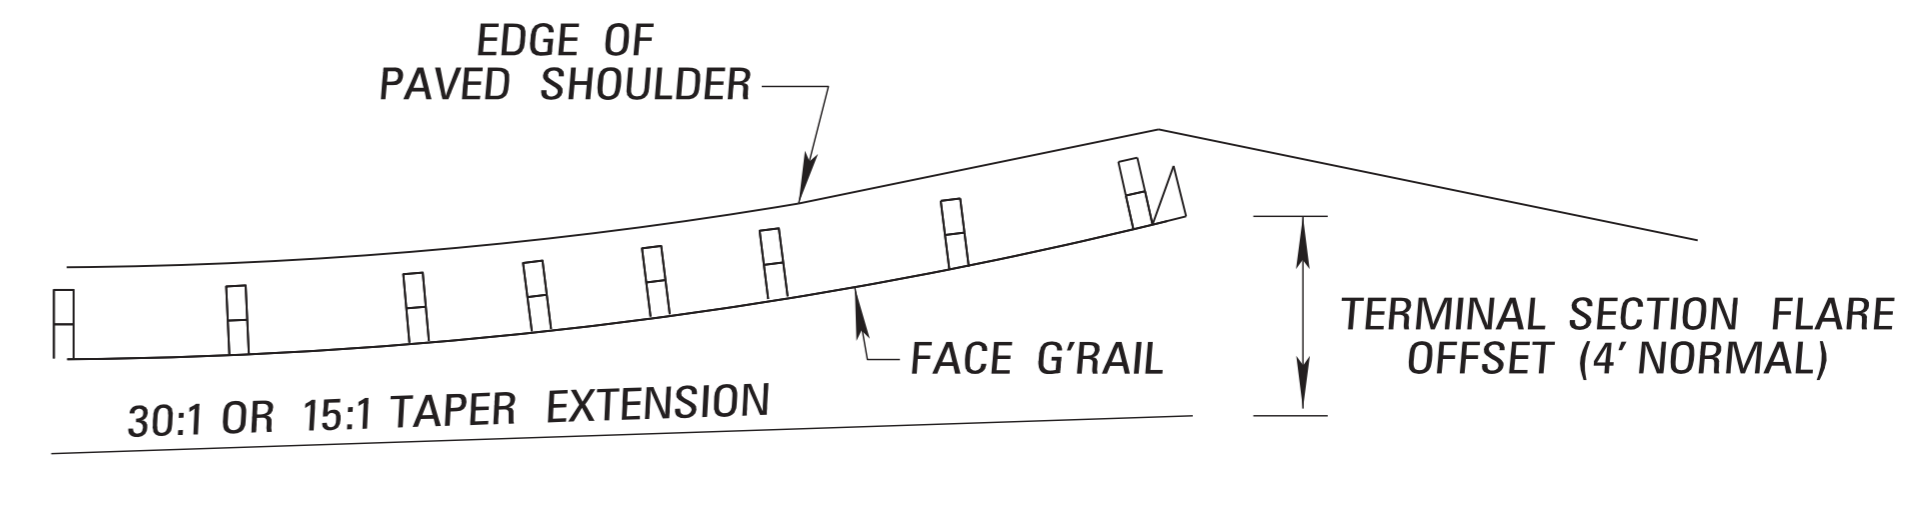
DETAIL OF PAVED SHOULDERS AT BRIDGE ENDS
